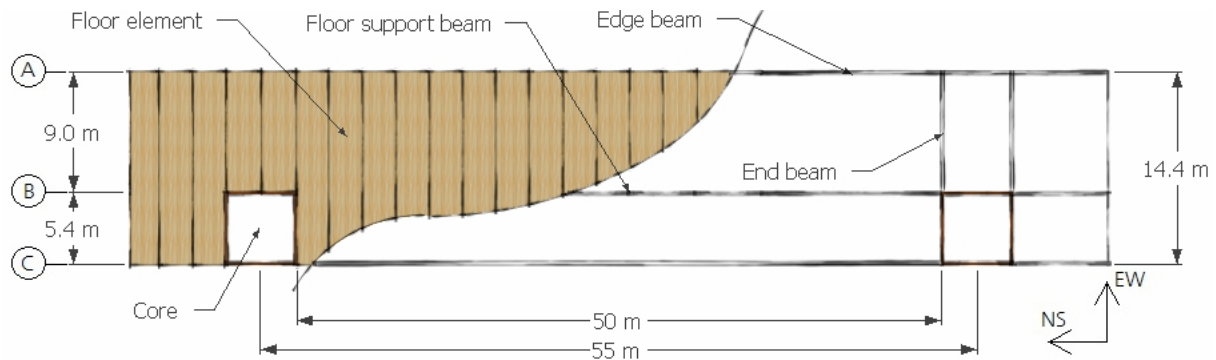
Support beams underneath the floor elements (indicative, not to scale)
